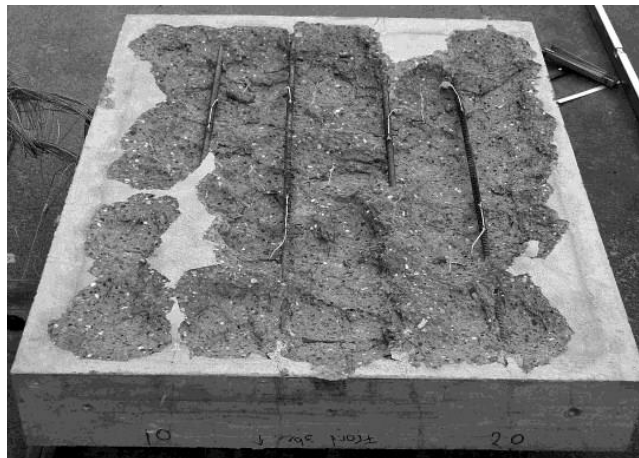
Spalled HPC slab without protective mortar.
